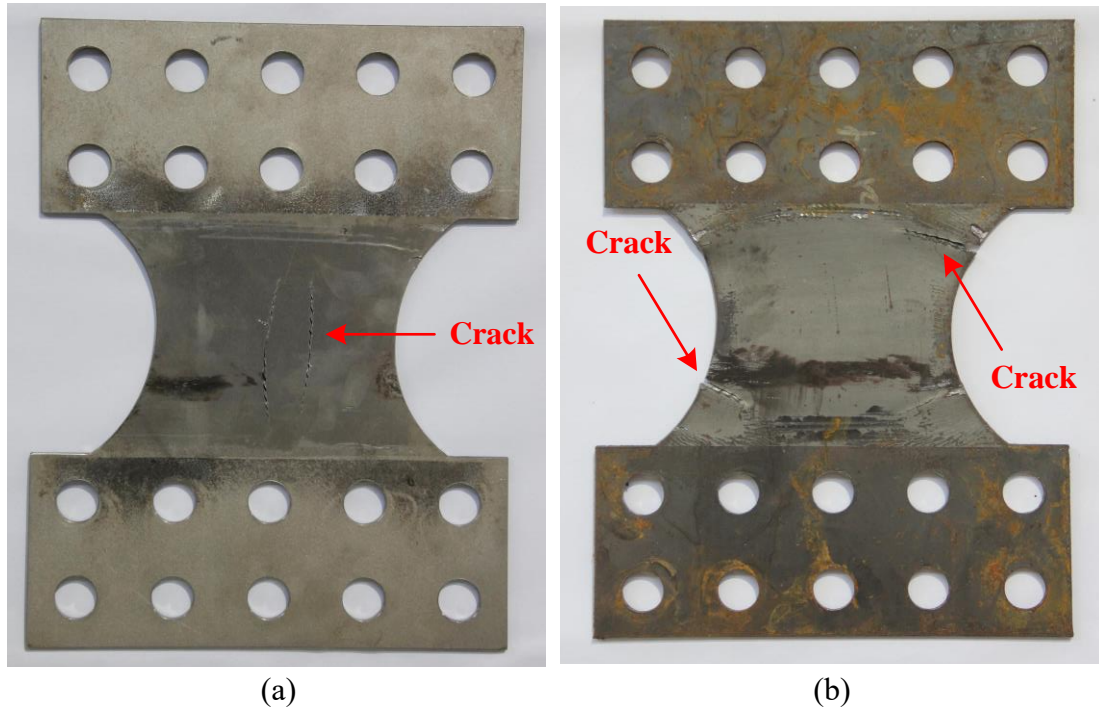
Failure modes of damper specimens: a) Fe-SMA damper, b) steel damper
